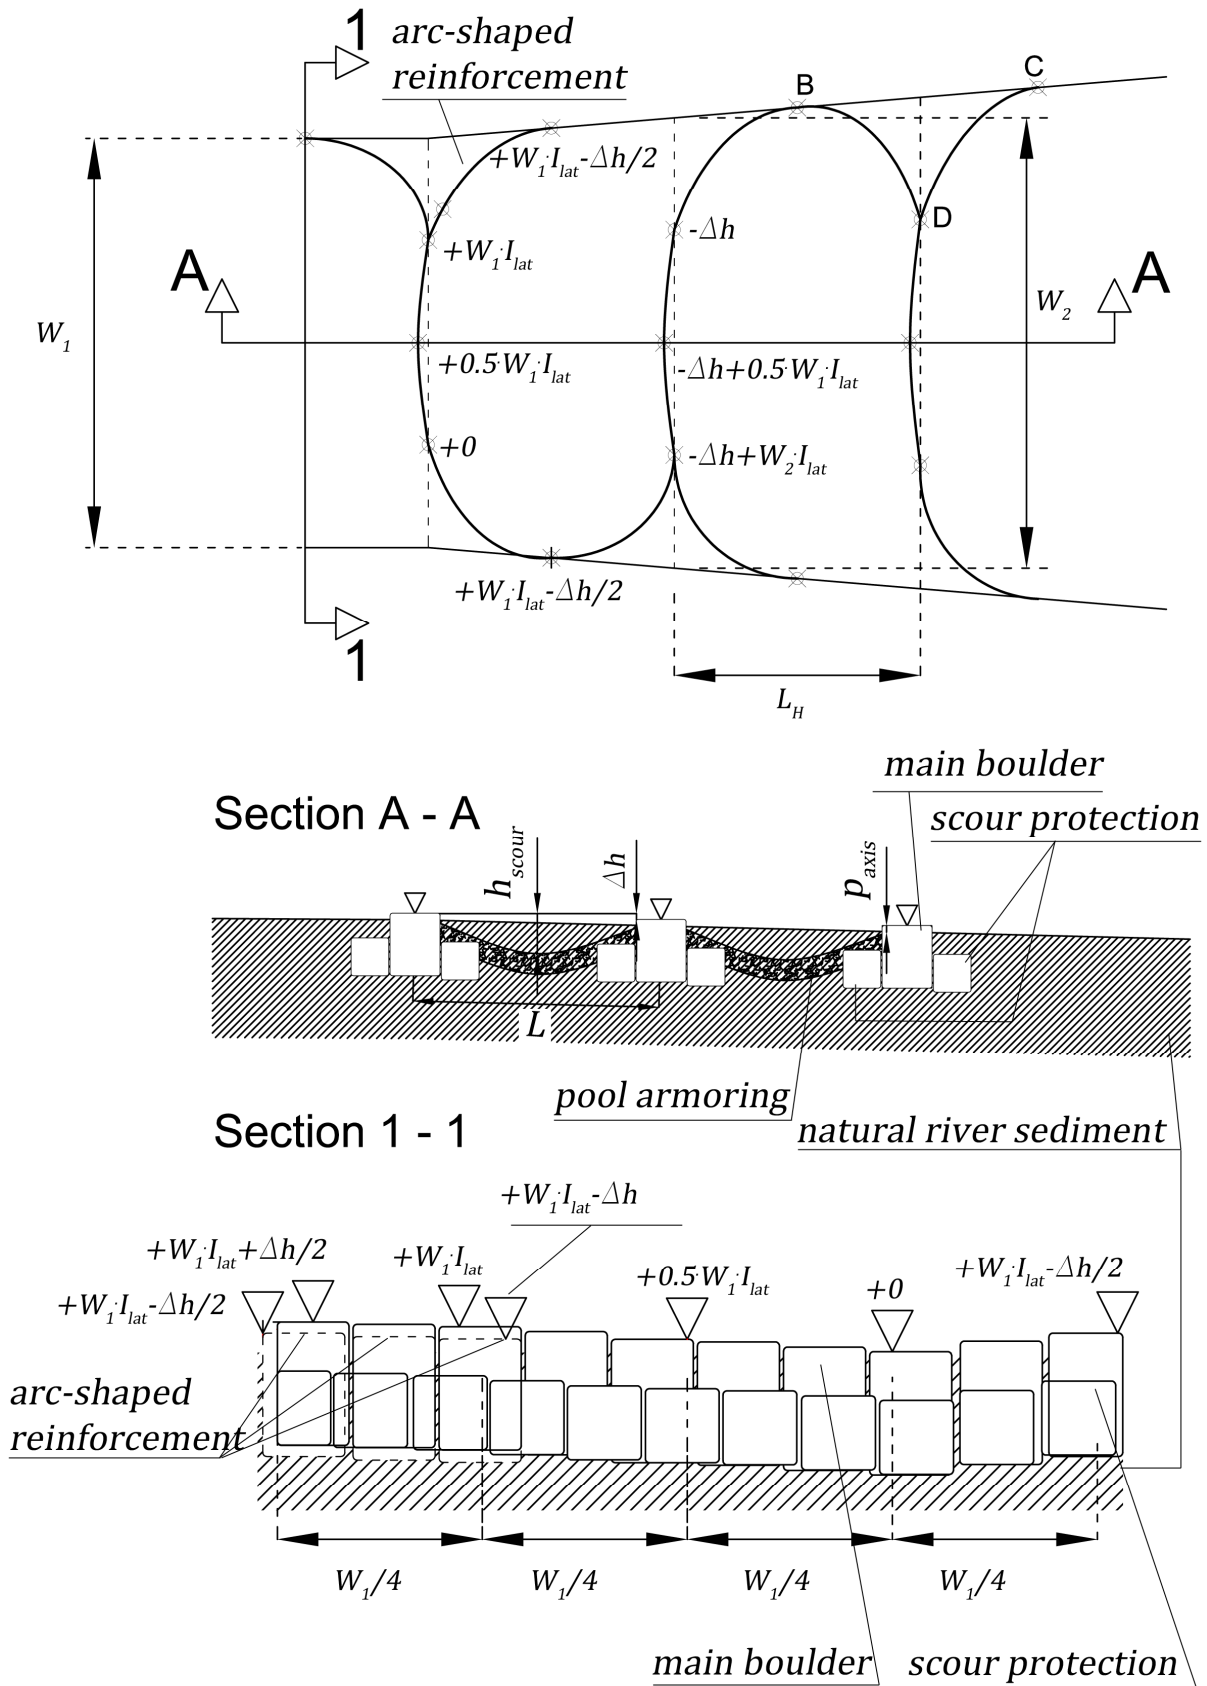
Ramp geometry: plan view and sections – relative elevation of the steps
